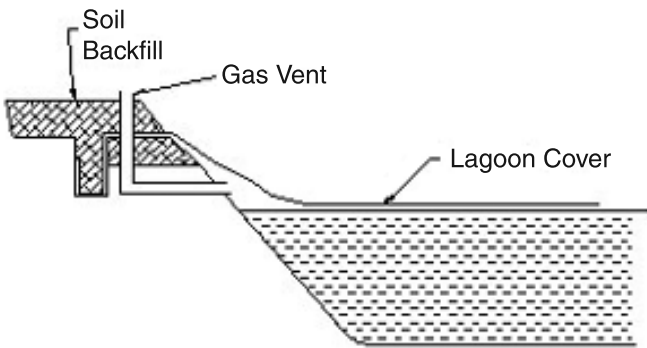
Fastening a cover to a berm using anchor trenches (gas vents are needed for impermeable covers only)
